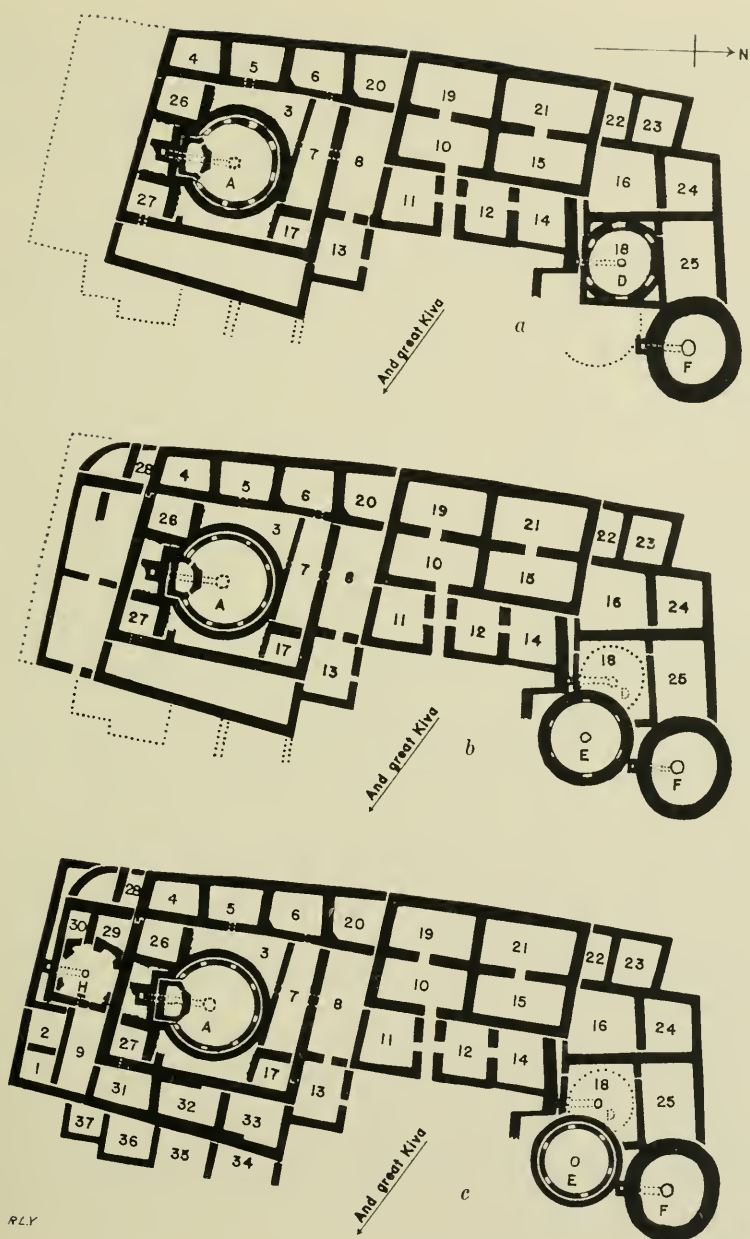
Plan showing growth of Lowry Pueblo. a, Third addition; b, Fourth addition; c, Fifth addition.
